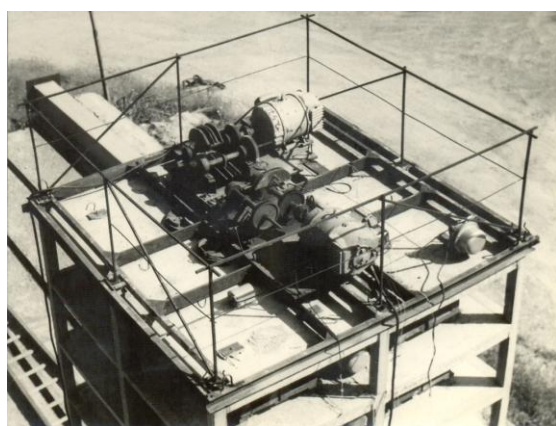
LABORATORY VIBRATION MACHINES FOR TESTING LARGE MODELS, PLACED ON THE SLAB OF THE 9TH STOREY (BEFORE MOUNTING THE DAMPERS) WITH A STEEL FRAME RIGIDLY FIXED TO THE STEEL CAPS OF THE NINE-STOREY FRAME BUILDING MODEL COLUMNS
